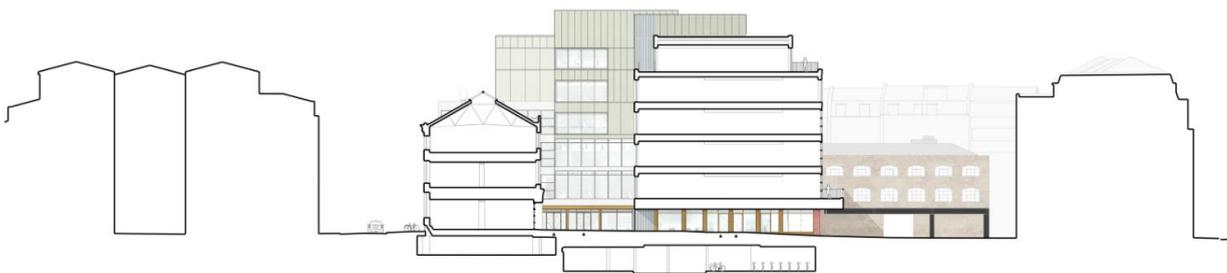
Proposed Laundry Yard Eastern Elevation (link to Bravington's Walk)
